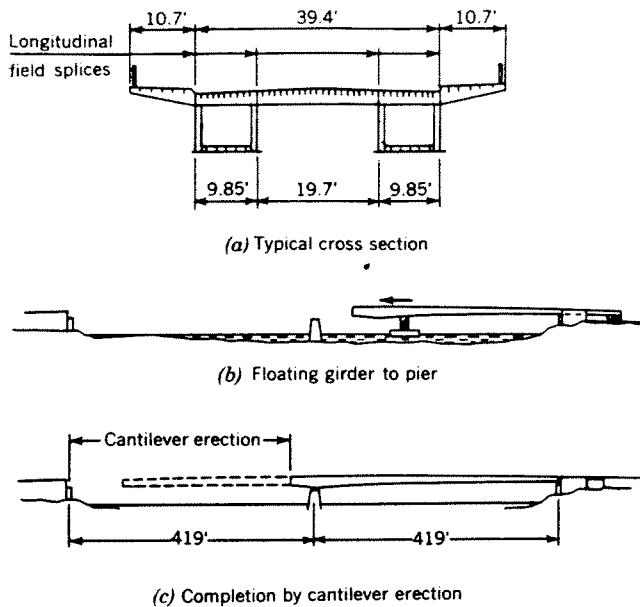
Erection of the Bridge over the Rhine at Kehl [72]
